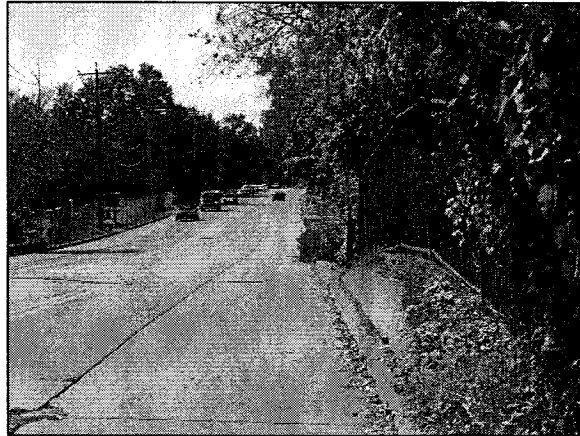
Discontinuous Sidewalks on Fuller Road
